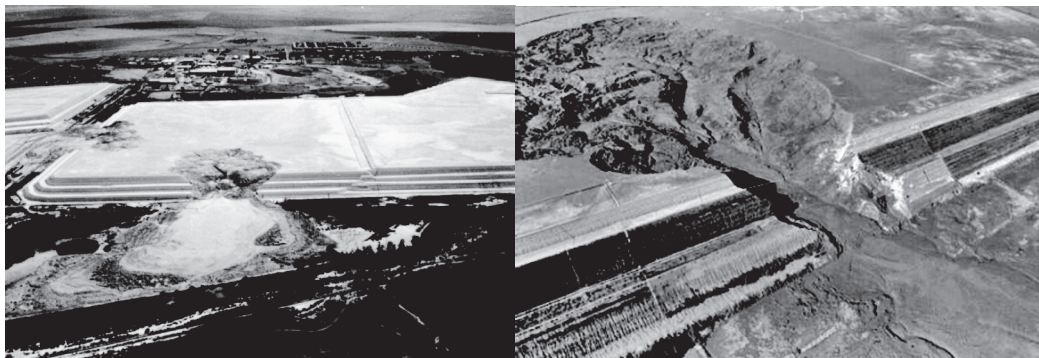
A bird's-eye view of the dam breach in: a) Saaiplaas tailings facility [19], b) Merriespruit tailing facility, [19]
